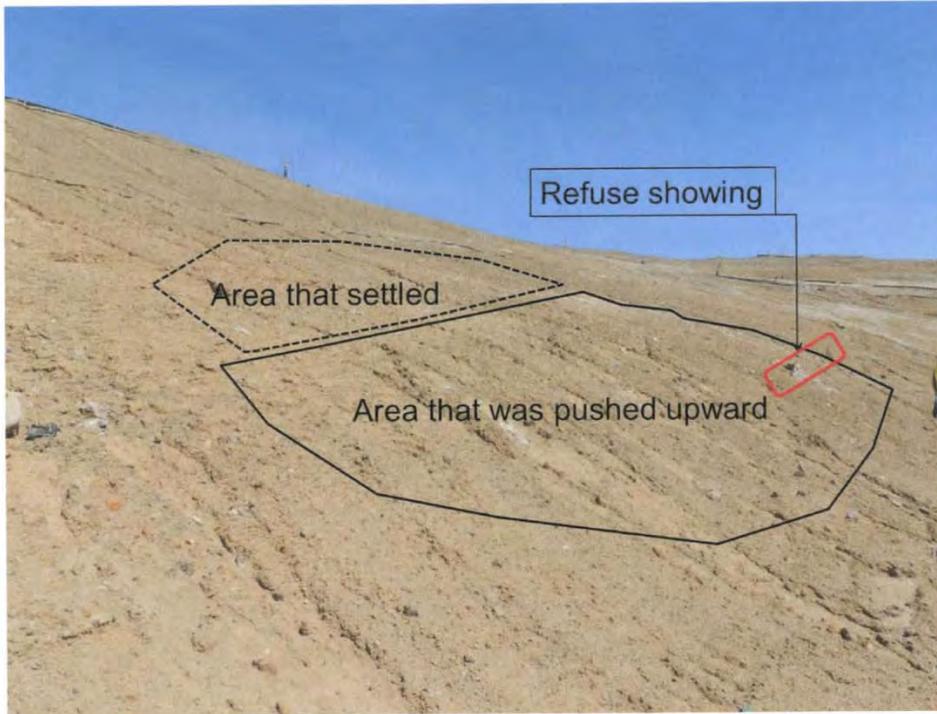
Area where inert waste is showing on southeast facing slope of old county landfill
